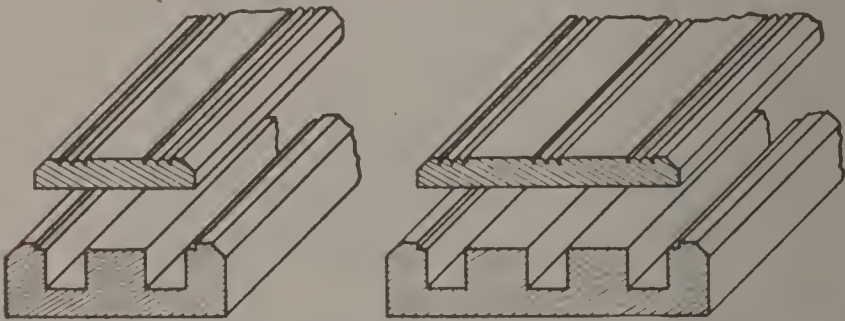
WOOD MOULDING, TWO AND THREE-WIRE.
